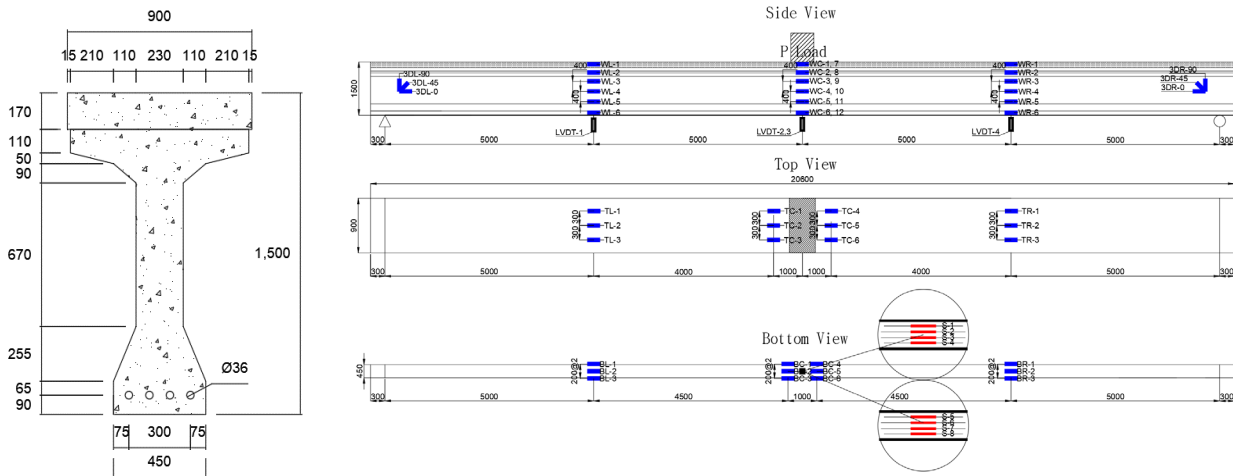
Cross section of a PSC-I girder bridge and Sensor set-up layout
